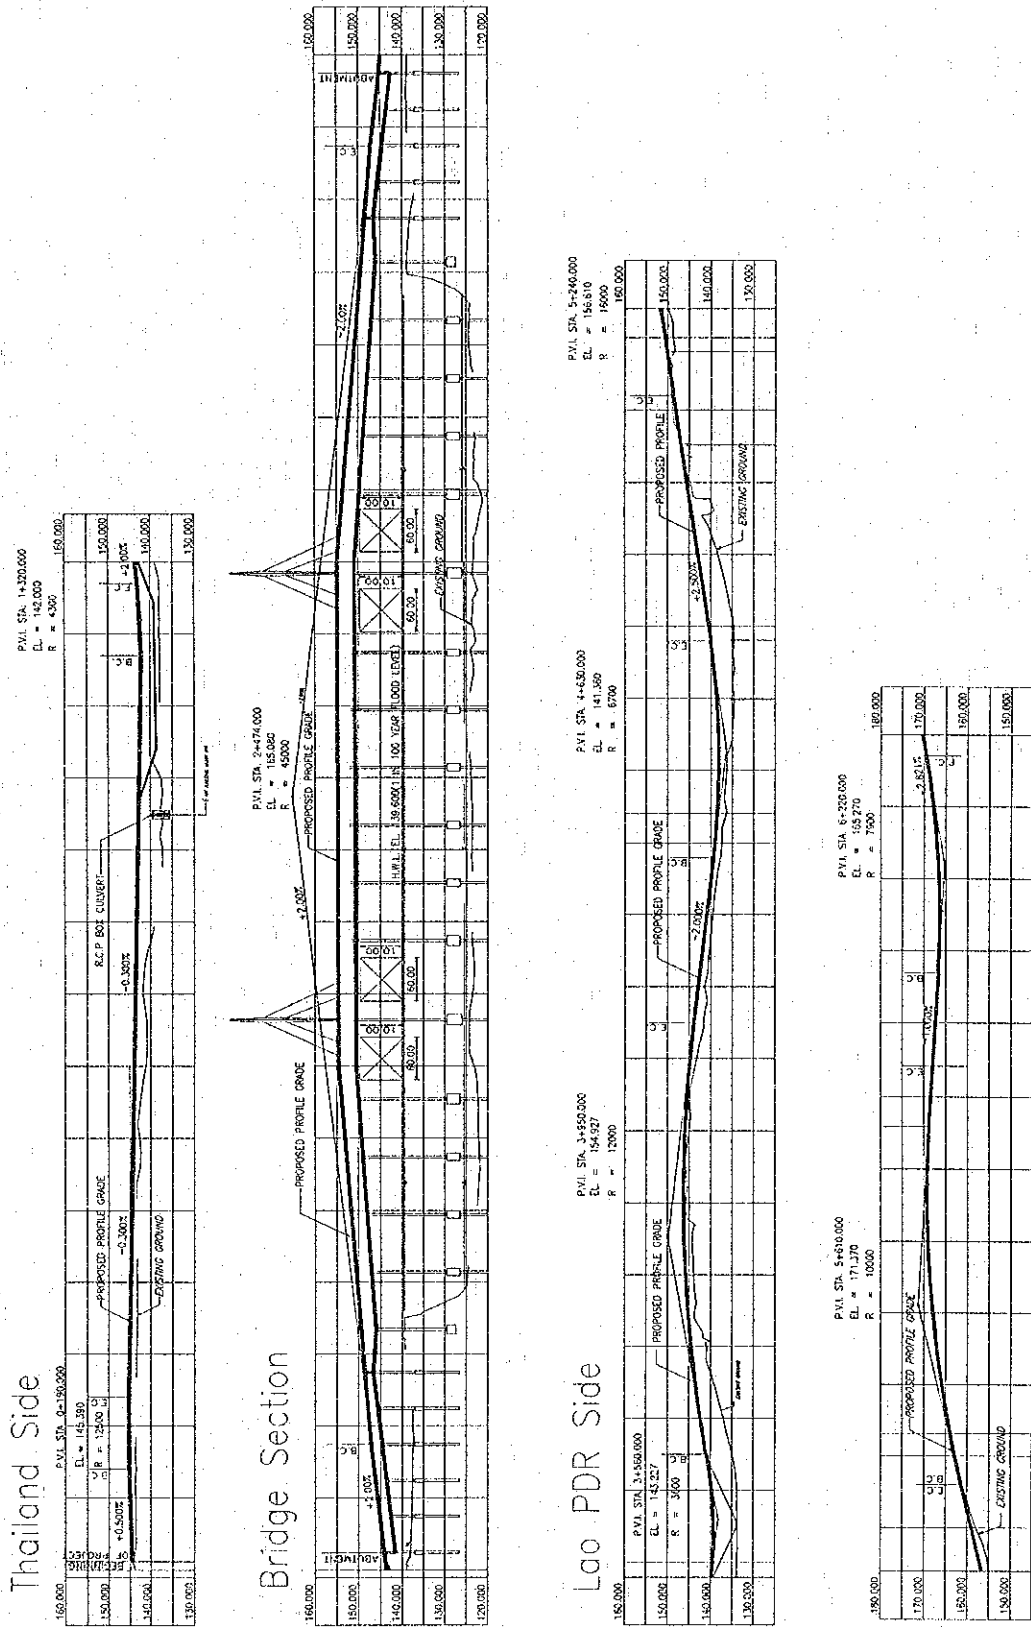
Vertical Alignment of the Bridge and Connecting Roads
